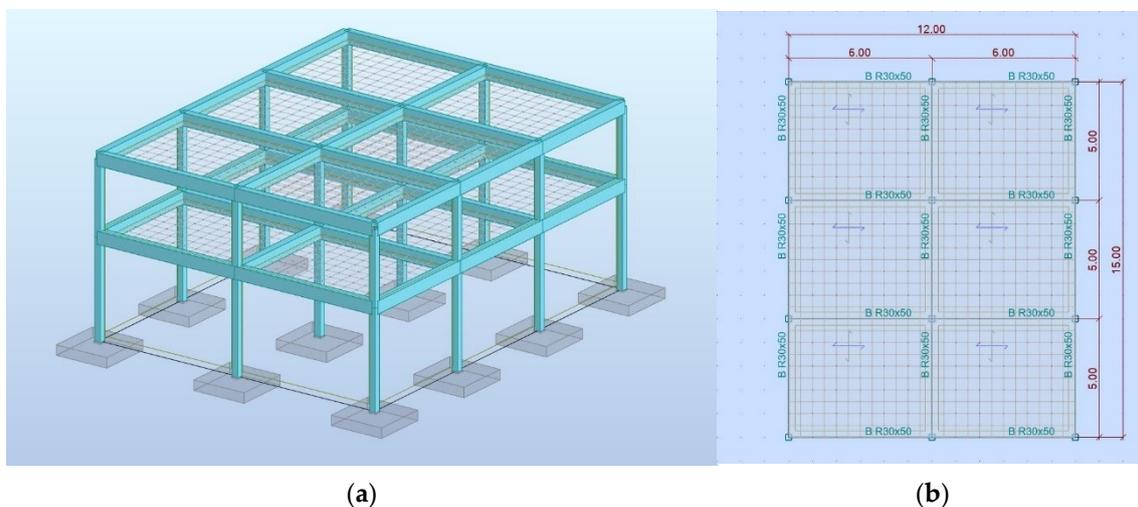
Reinforced concrete structure model under analysis: (a) general view; (b) view of the reinforced concrete structure (geometric dimensions in m).
